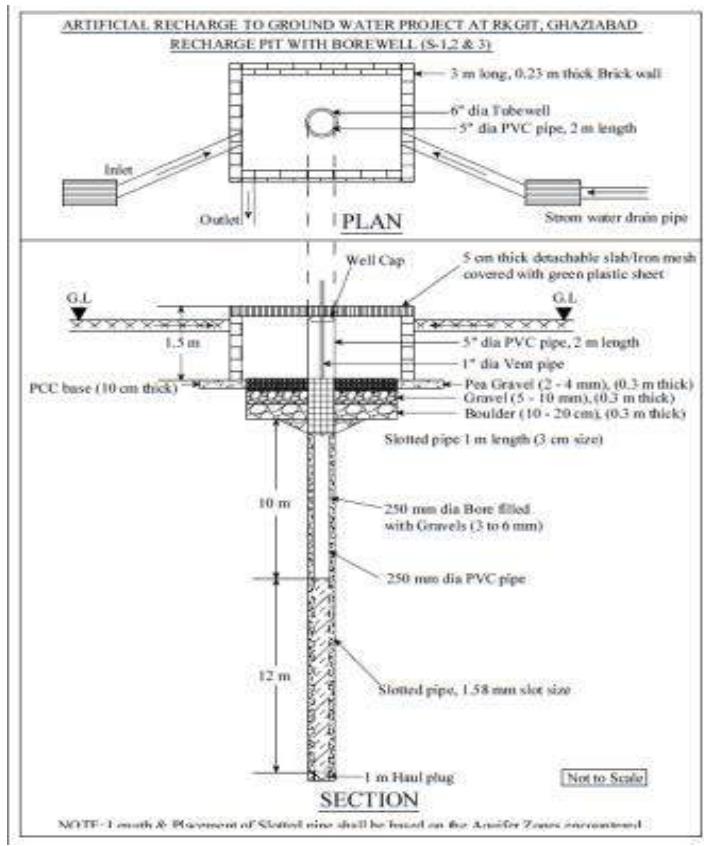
Design of proposed rooftop rain water harvesting structure
